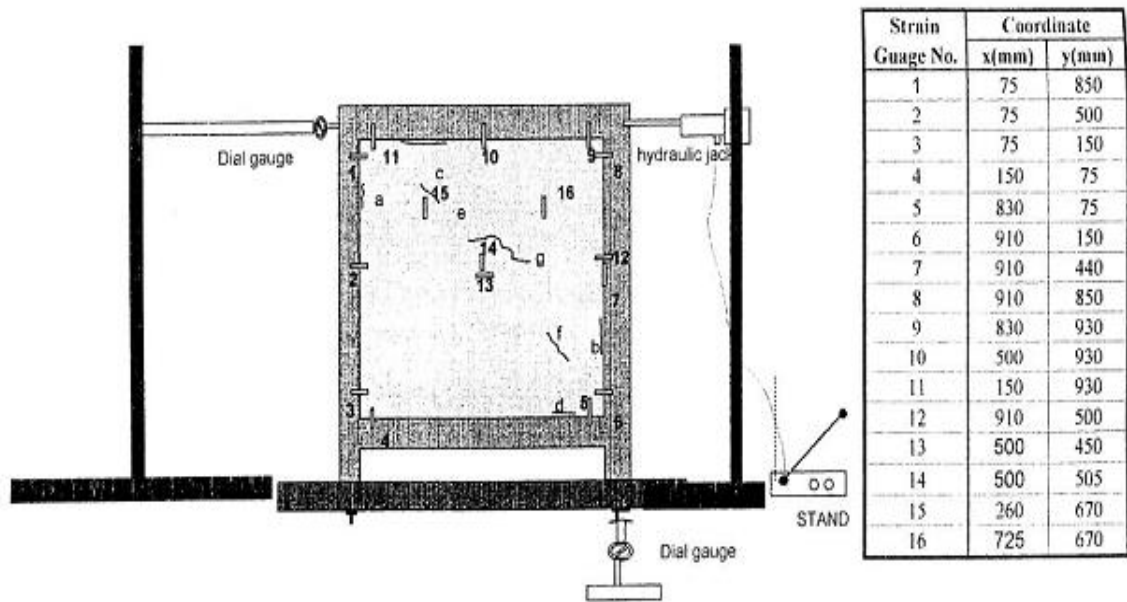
Test setup for infill RC frame [Sumat Shrestha (2005)]³¹
